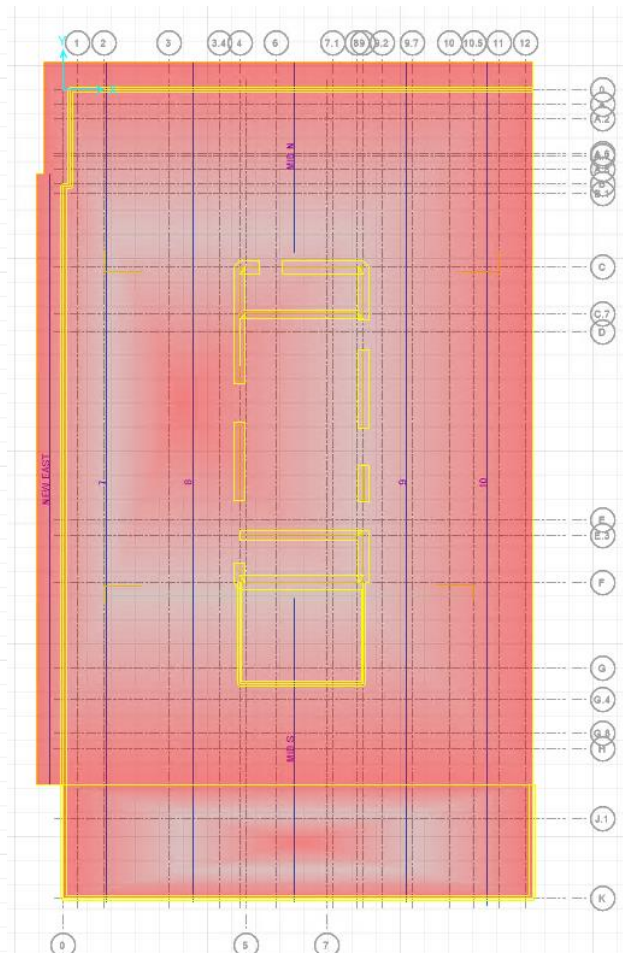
Rebar Design Strip in North-South Direction (Layer B)
